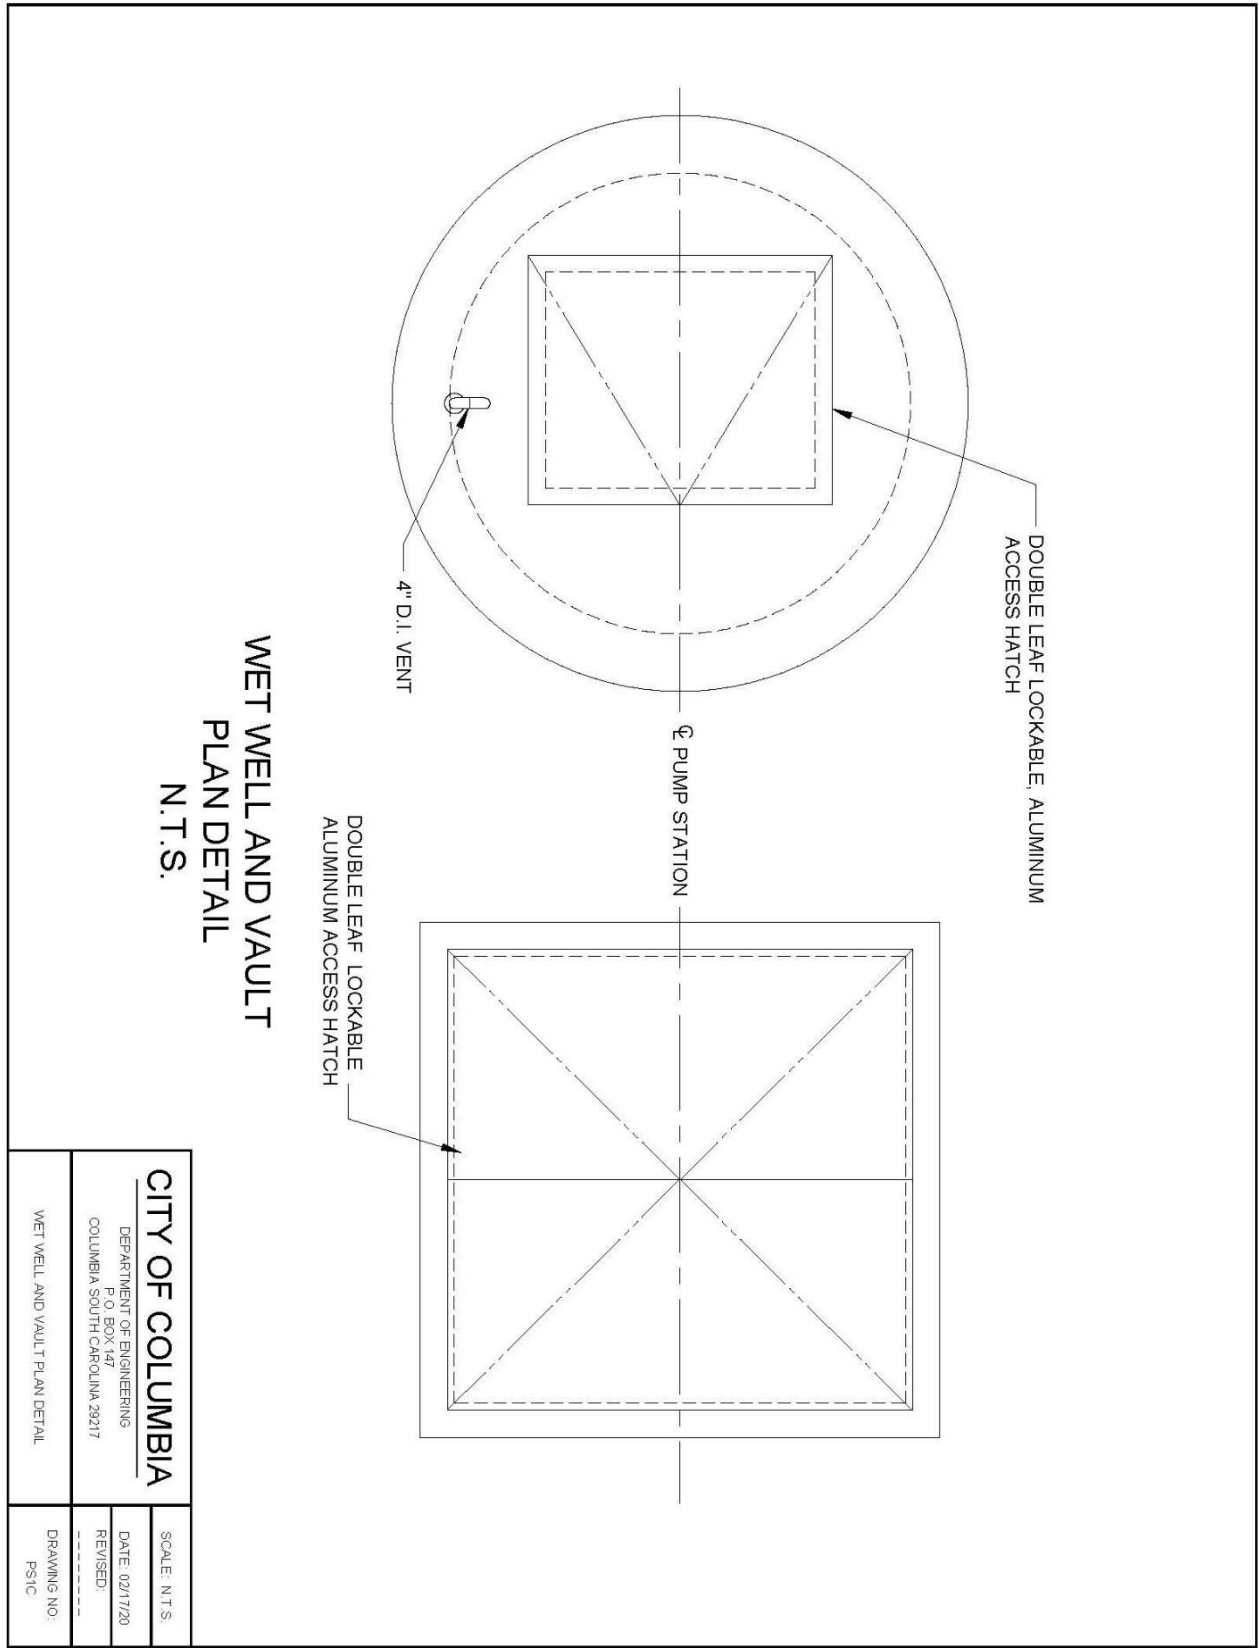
PS1C - Wet Well and Vault Plan Detail (2)
